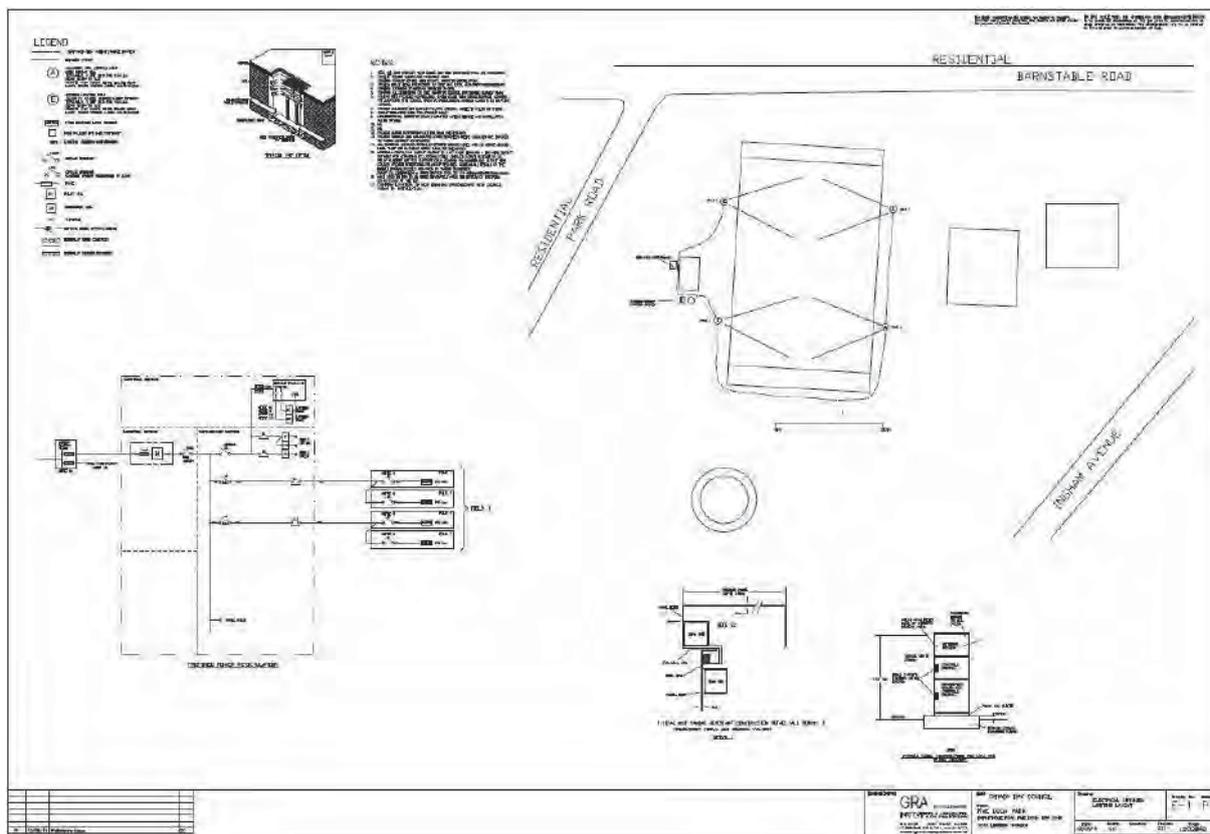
Proposed lighting installation plan (Received by Heritage 21 on 22.09.16).
